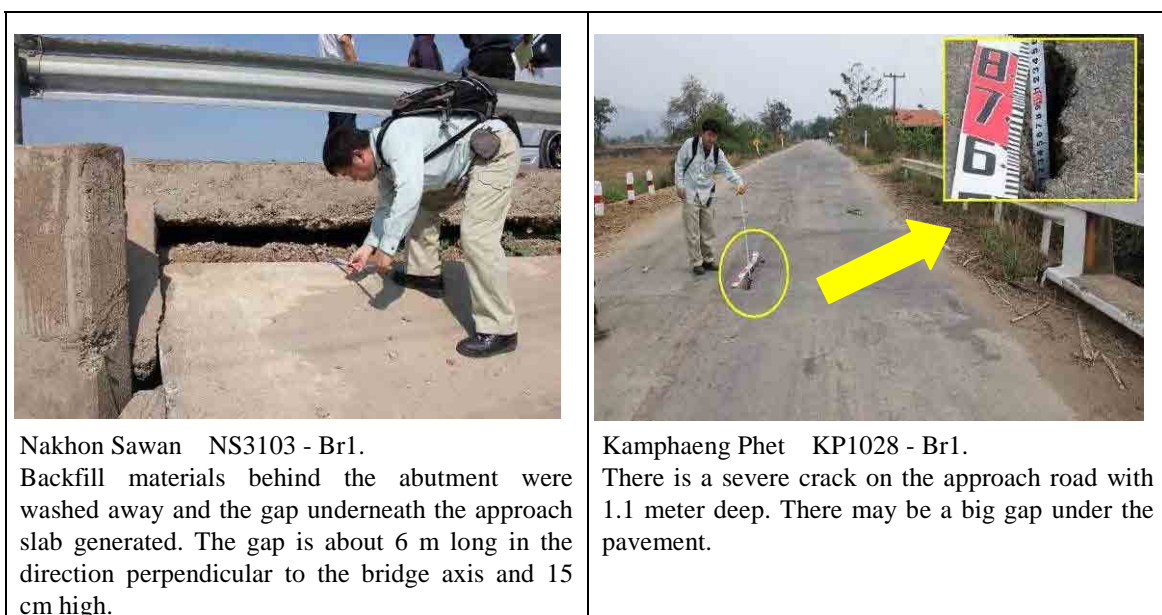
Sinkage of approach road & cracks on the road caused by washing away backfill materials behind abutments
